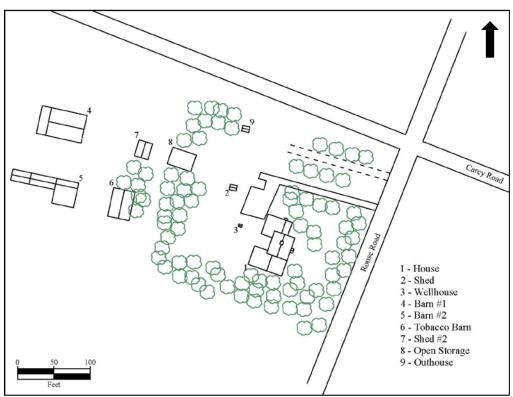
Site plan of the Rouse House and Outbuildings (LR1599).
